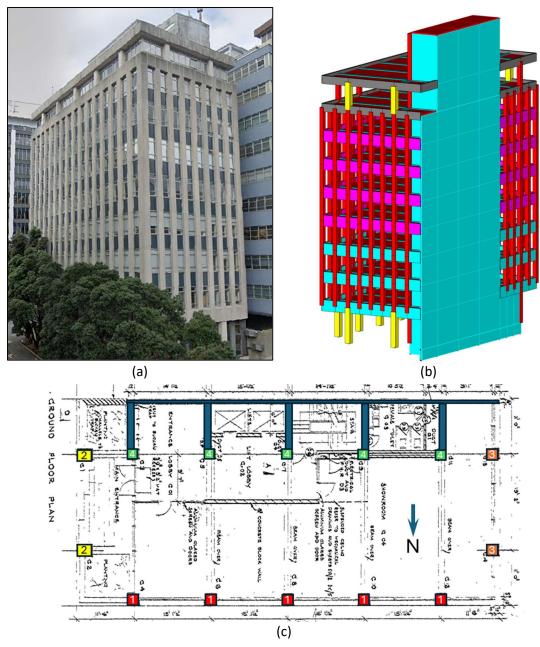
(a) Overall view of the building, (b) Rear of the building as modelled in SAP 2000, and (c) First storey plan view.
